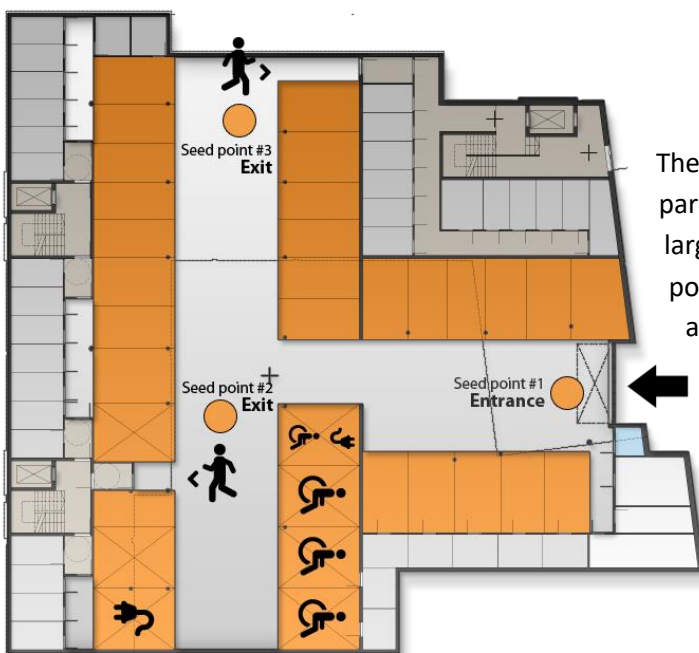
Teaterkvarteret 1.akt floorplan and apartments
